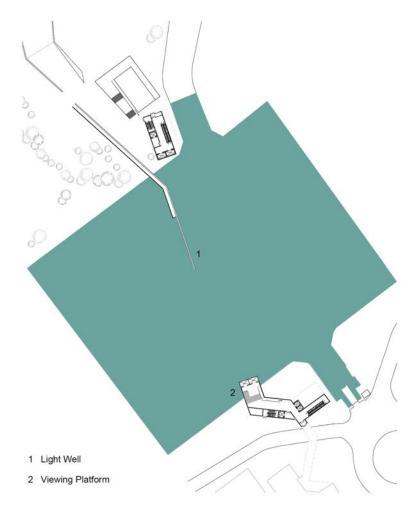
Ground Floor Plan, Scale: 1/1500
